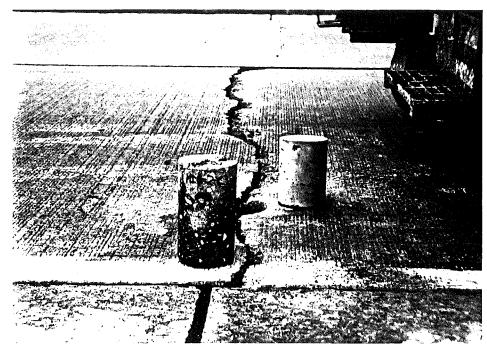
Typical crack in section MI1-2, recycled concrete on open-graded drainage course.
